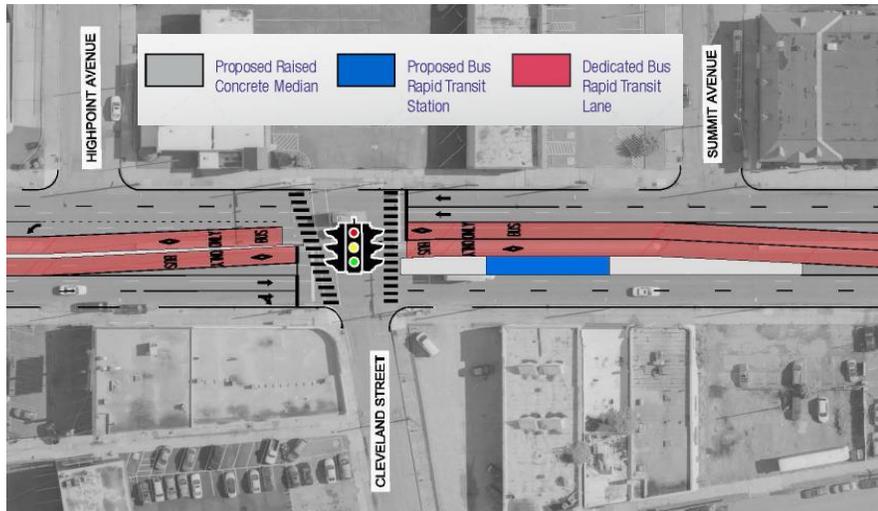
The location of the proposed BRT station and raised concrete median extended beyond Summit Avenue.
